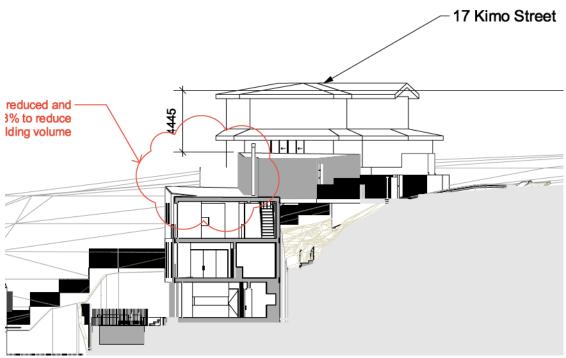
excerpt of plan section showing the proposed dwelling house on approved Lot 1 against the context of the existing dwelling house at 17 Kimo Street
